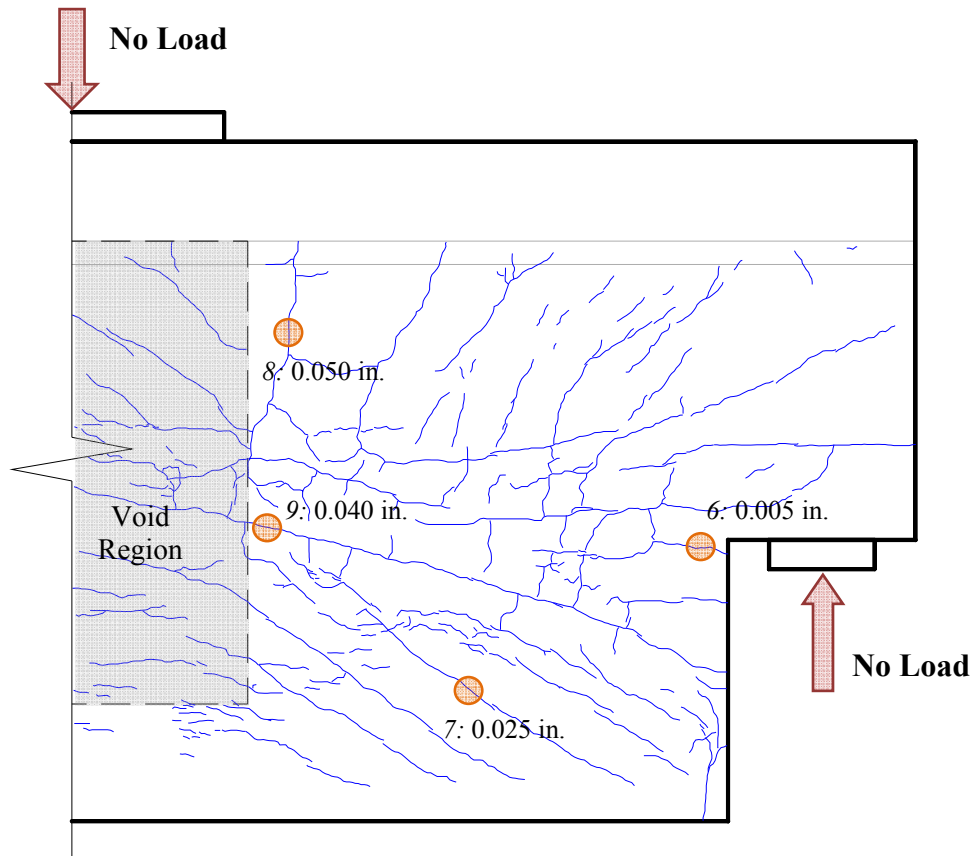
Pre-test cracking and crack widths due to ASR and DEF on the east side of the tested shear span of beam RF-3R-9(a).
